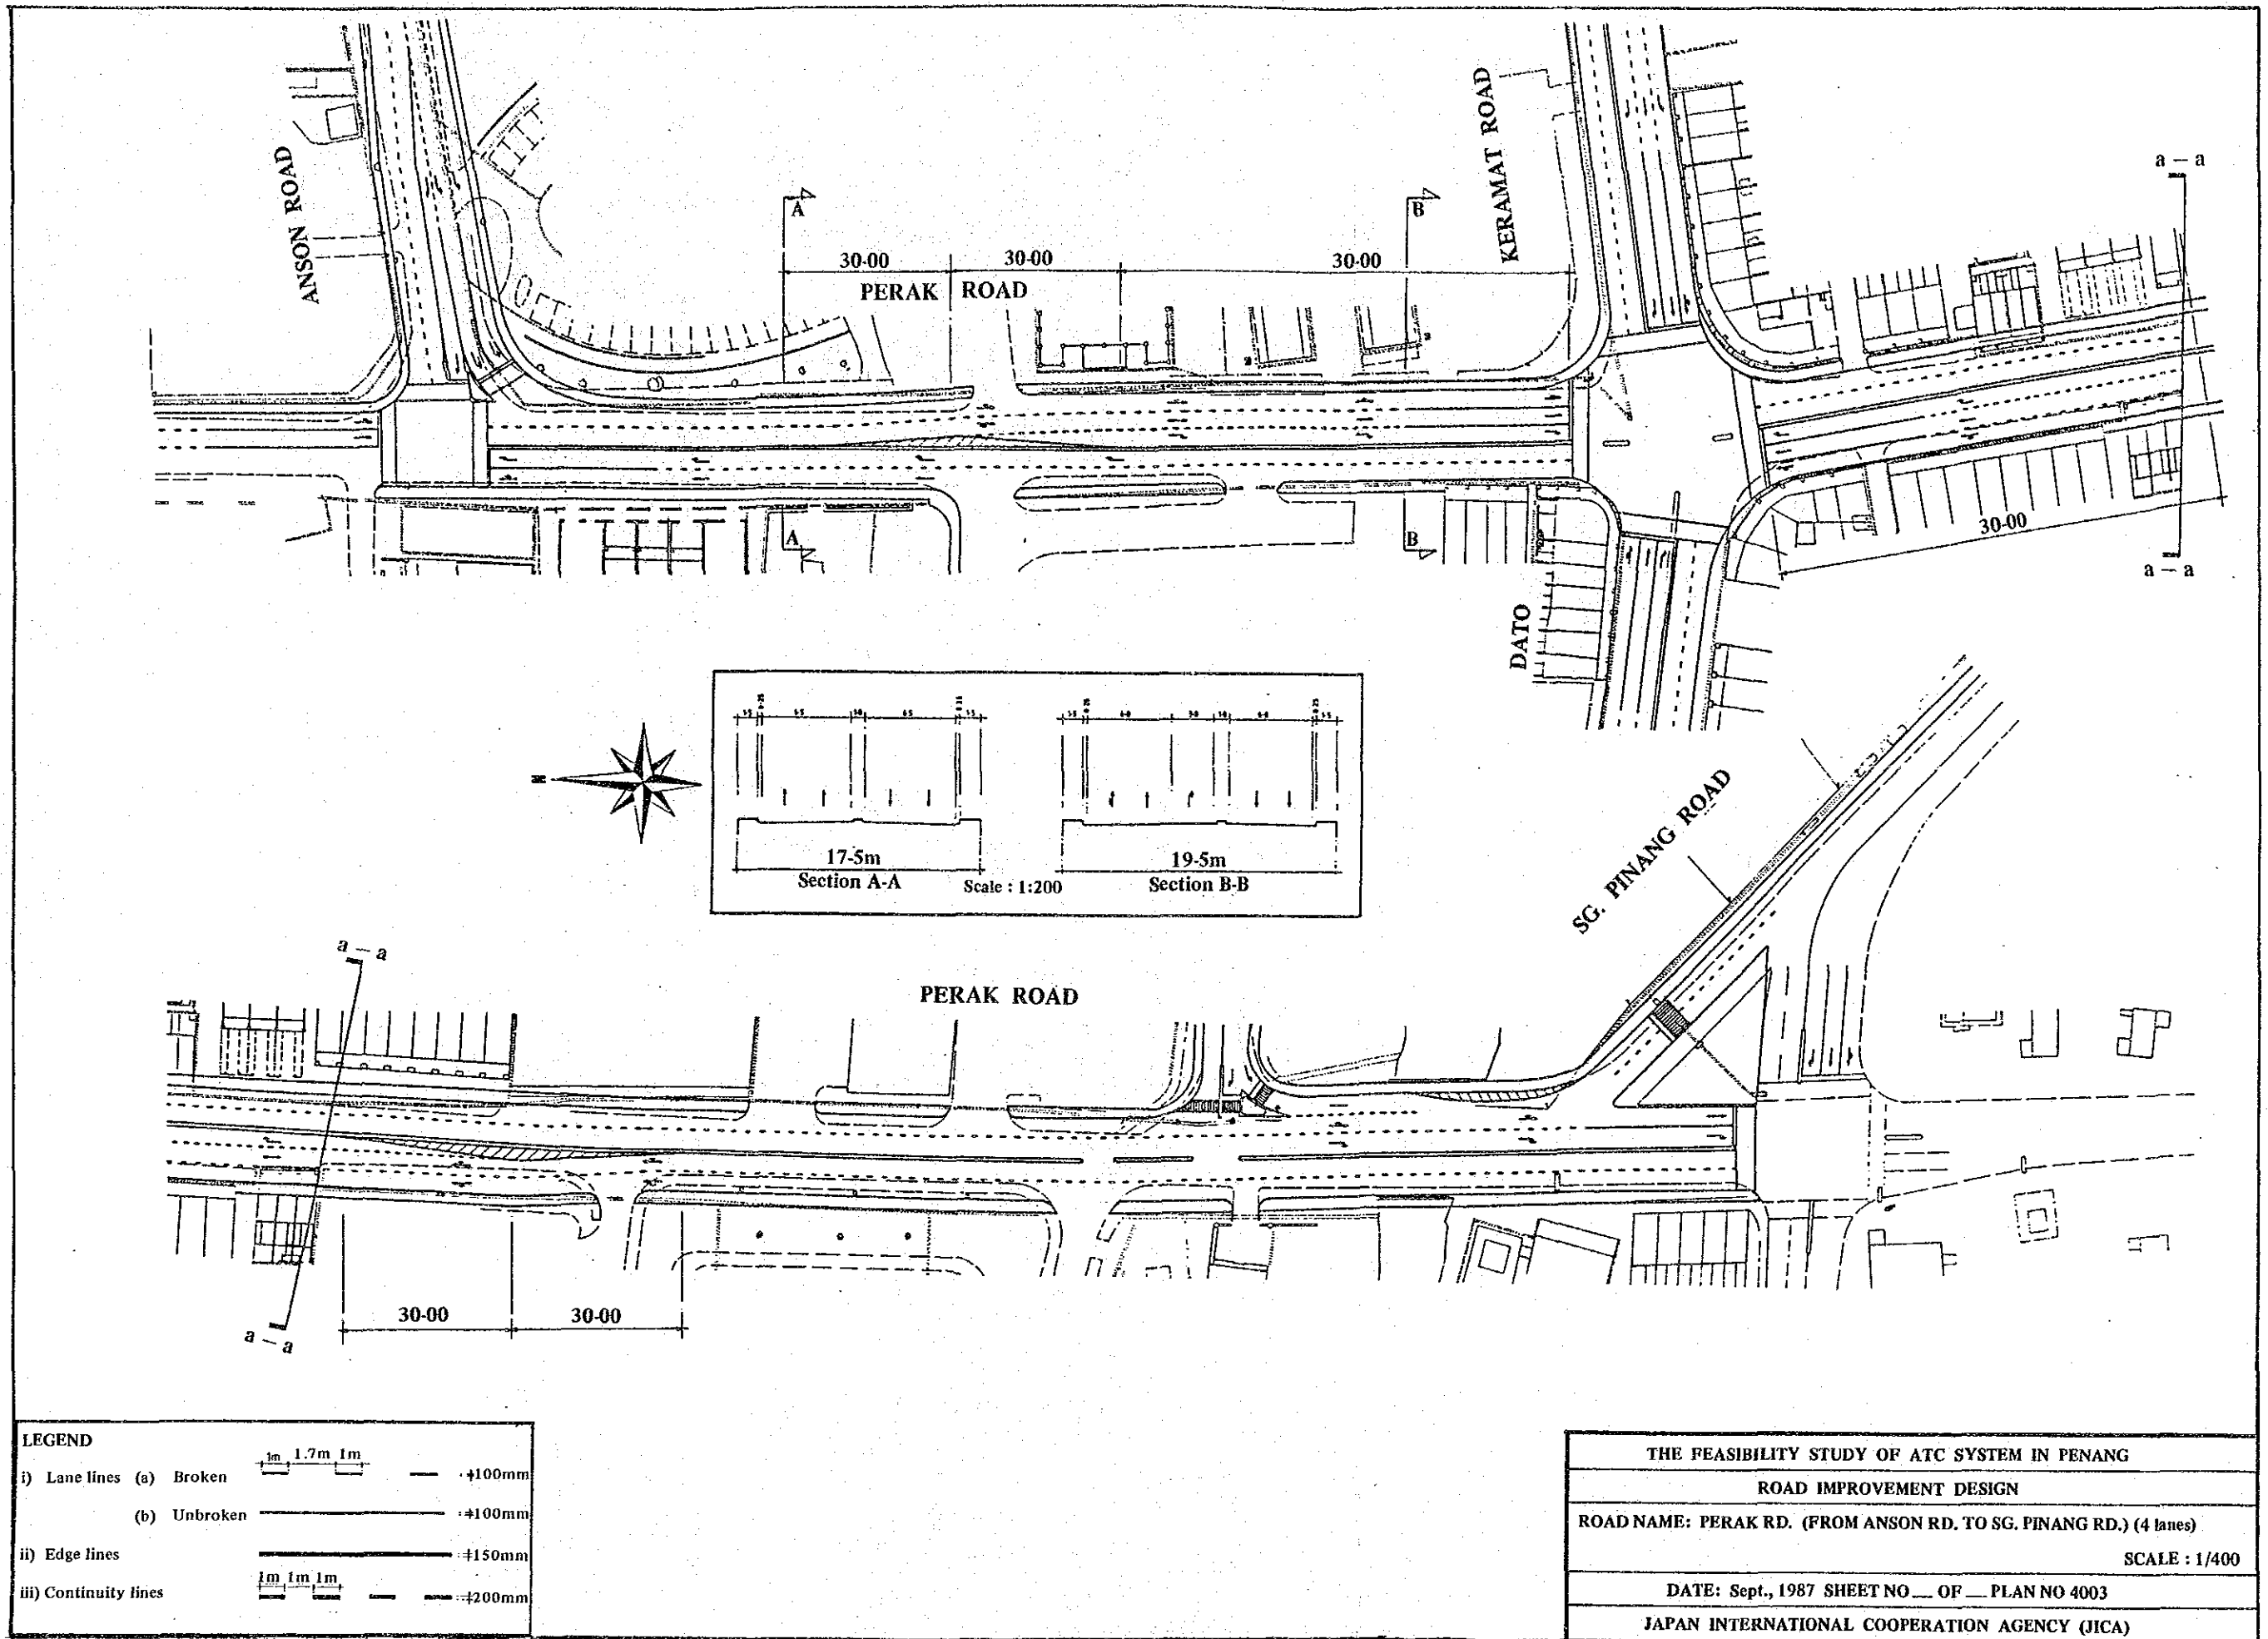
Layout Plan Of Perak Road With Two Lanes In Each Direction
